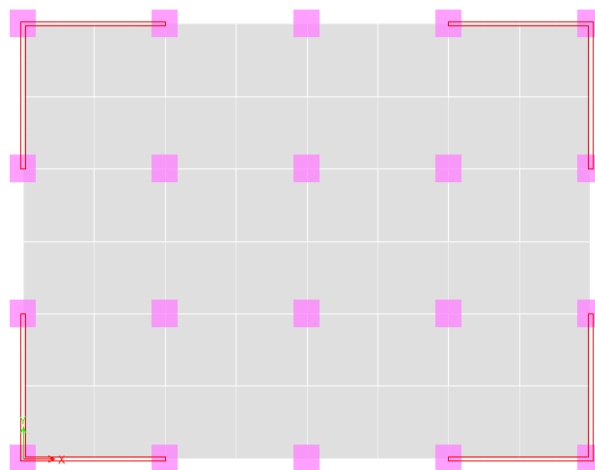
2D plan of 8th story rectangular shape building case SW7
